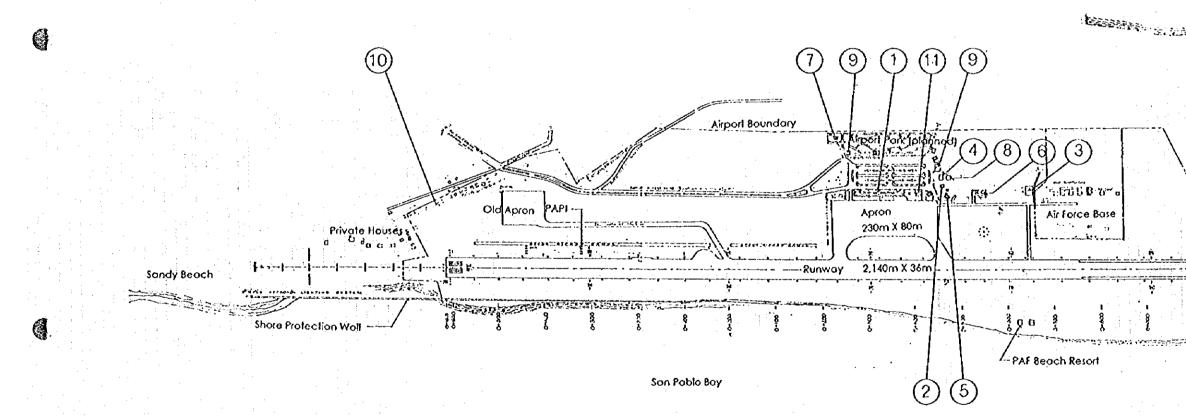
Existing Layout of Facilities at Tacloban Airport
